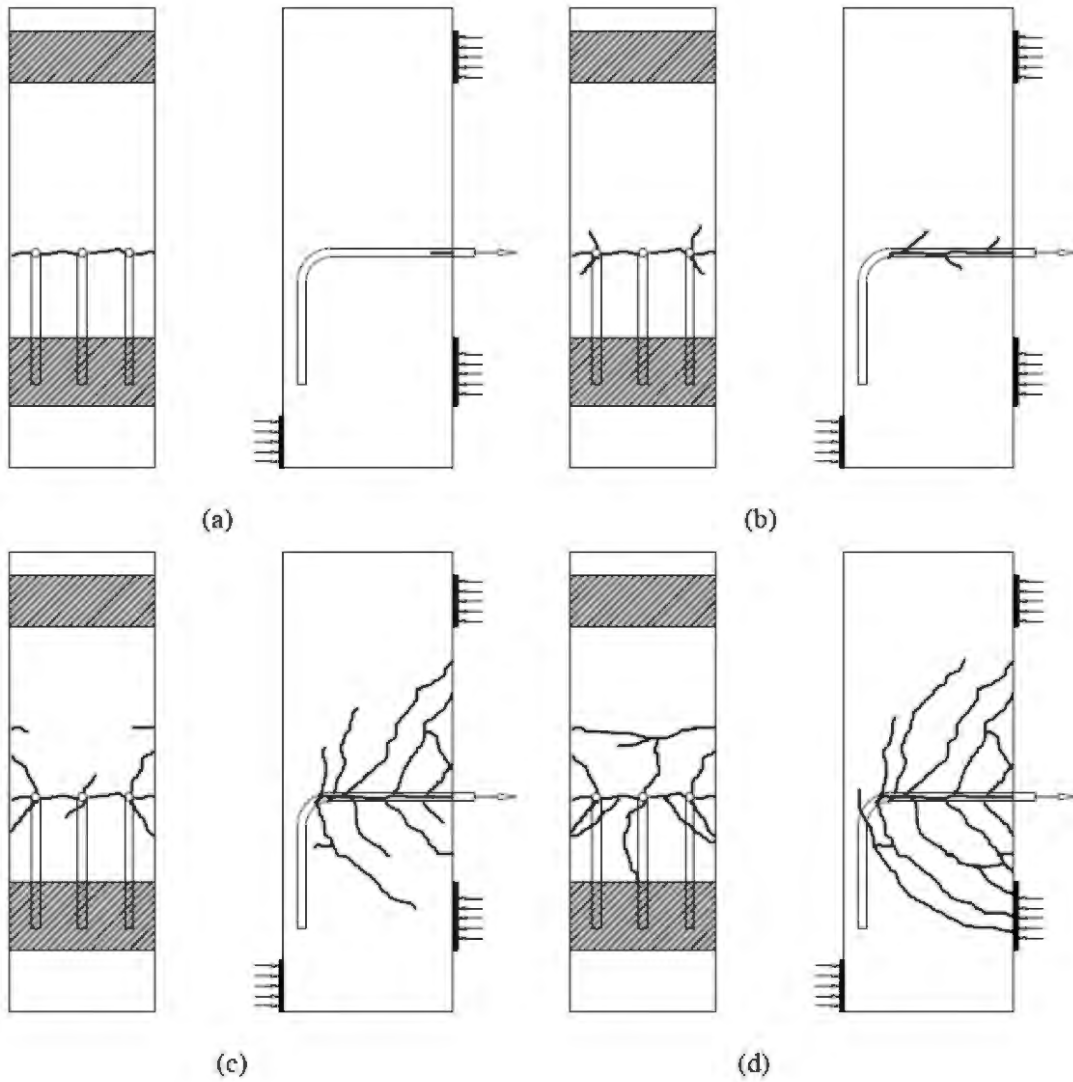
Crack progression observed in the beam-column joint specimens containing hooked bars (Sperry et al. 2015b, 2017a). Breakout failure is preceded by bond slip of the straight portion of the bars and cracking of the concrete
